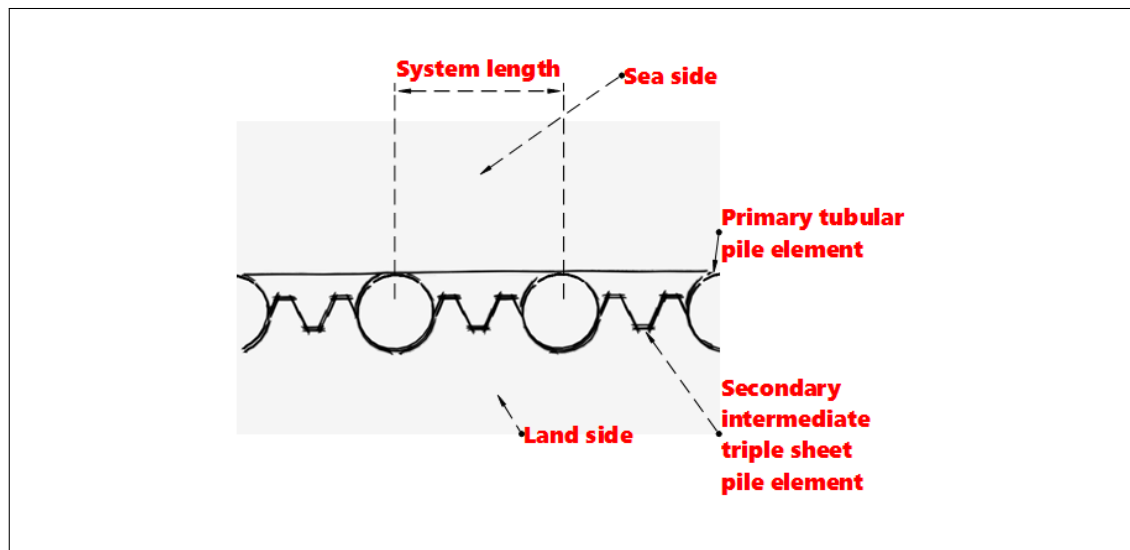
Top view cross-section of a combined wall system, used SketchUp
